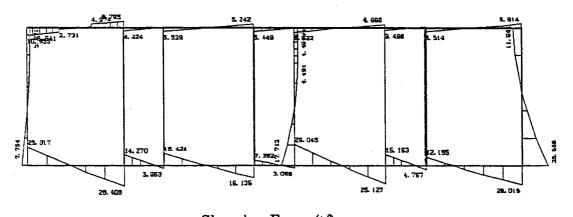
Load and Sectional Force of Box Culvert Section (Case 2)
